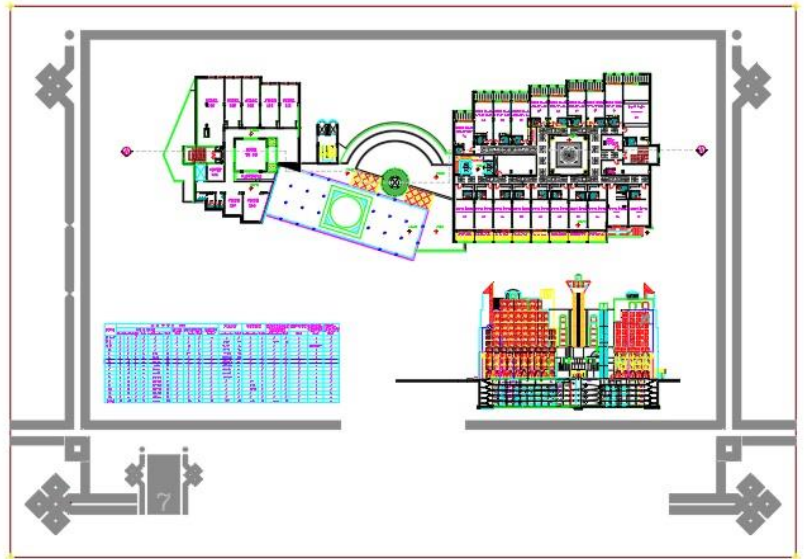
Conceptual design poster showing the Ground Floor and Section.
